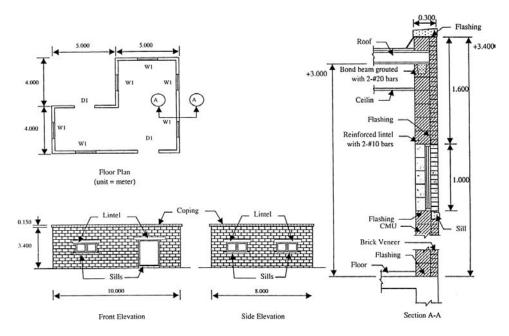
Floor plan, elevations, and cross-section of a one-story building.
